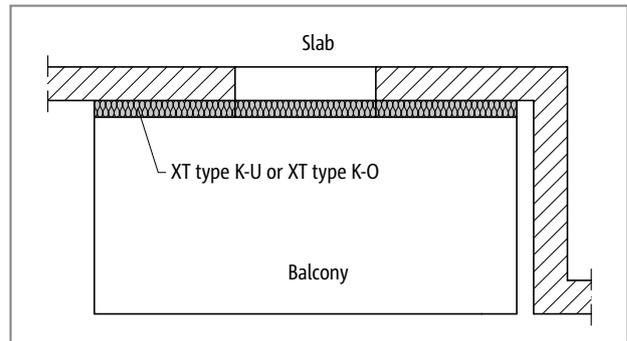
Schöck Isokorb® XT type K-U/K-O: Balcony with facade offset
